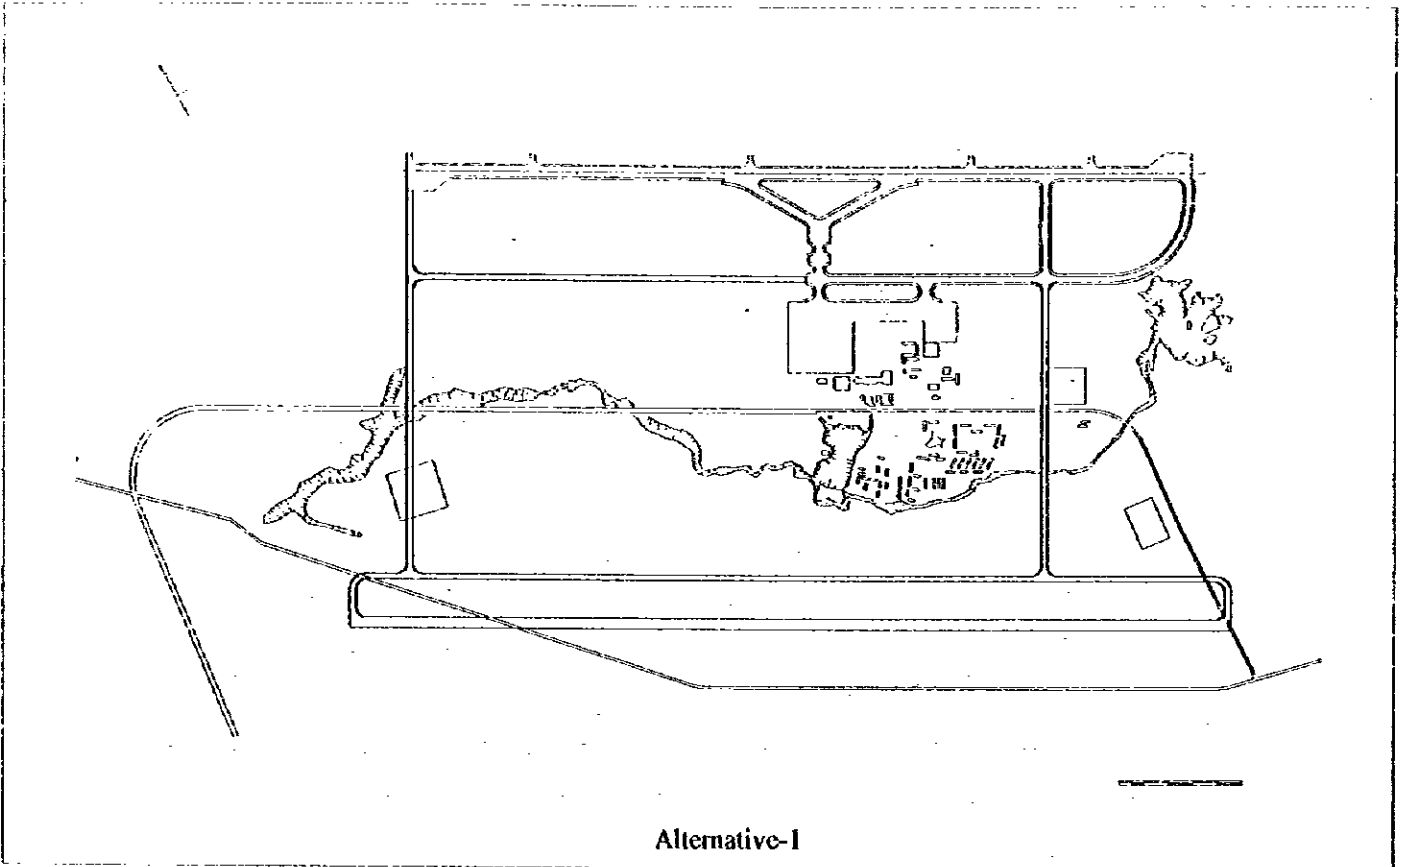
Alternative Layout of Connecting Taxiways
